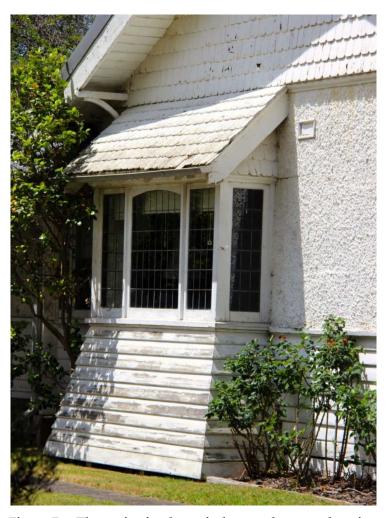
The projecting box window on the west elevation with a detail of the splayed base clad with mitred weatherboards, geometric leadlight timber windows and shingled roof. Half of the base of the exterior walls is timber, with roughcast render to the top half of the wall.
